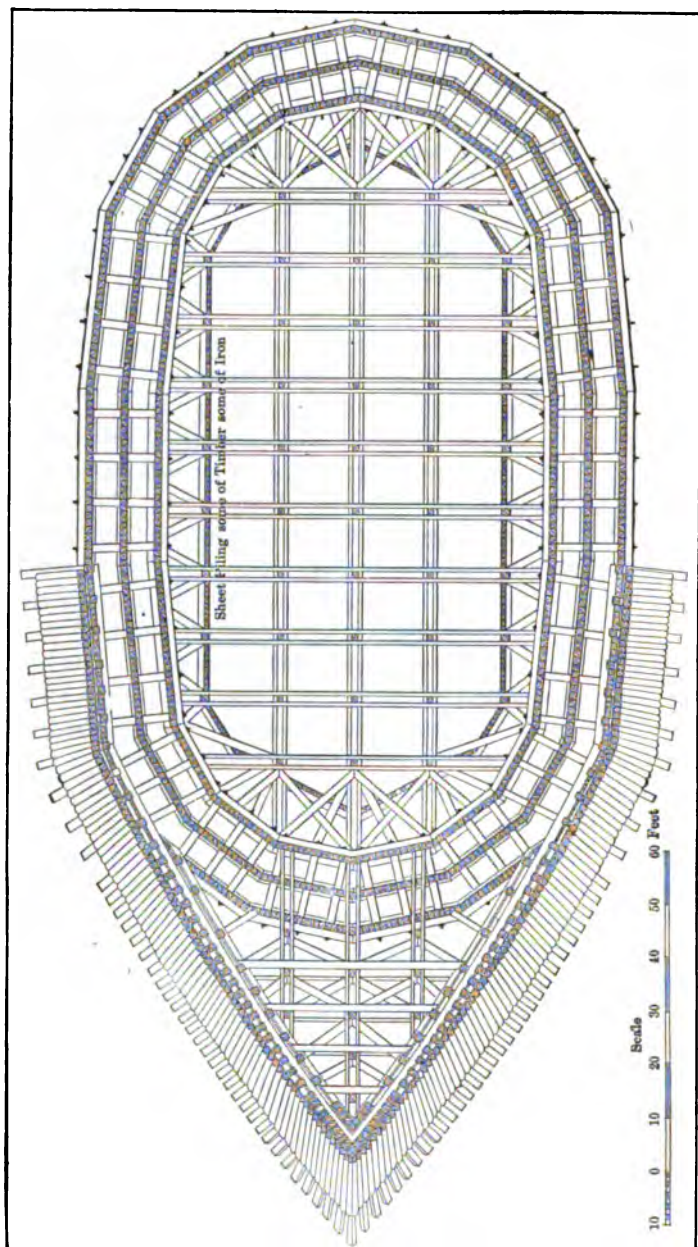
BUDA PESTH SUSPENSION BRIDGE, PLAN OF COFFER-DAM No. 3.
